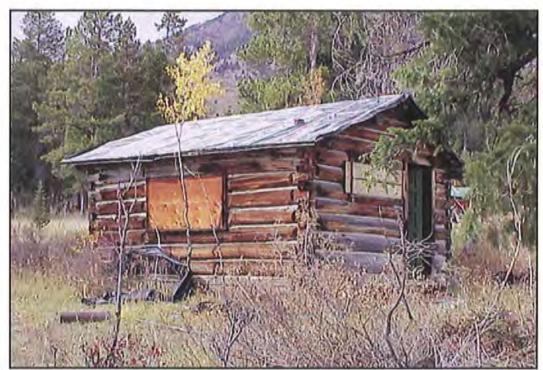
South and east walls of HS-1157, Cabin 12. Source: A&E Architects, 2004.
